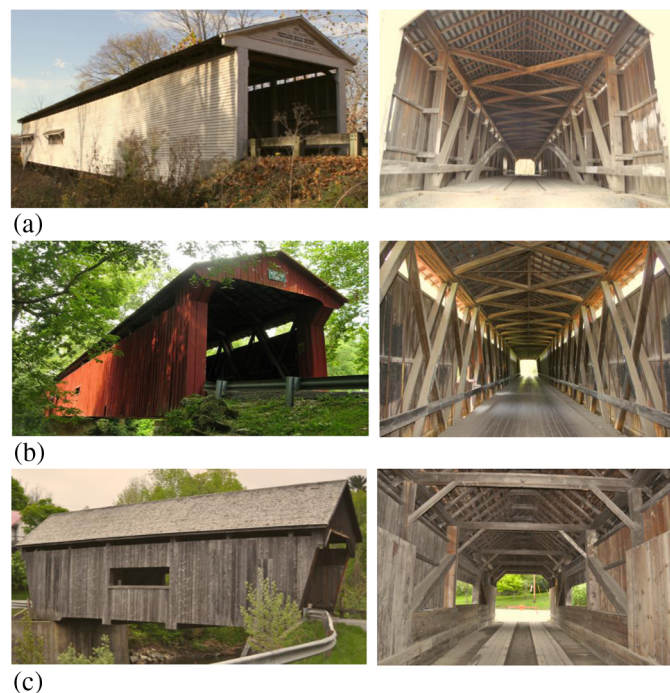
Photographic overview and interior view for each of the historic covered bridge types: (a) Burr arch truss; (b) Howe truss; (c) queen post truss (images by Travis K. Hosteng)
